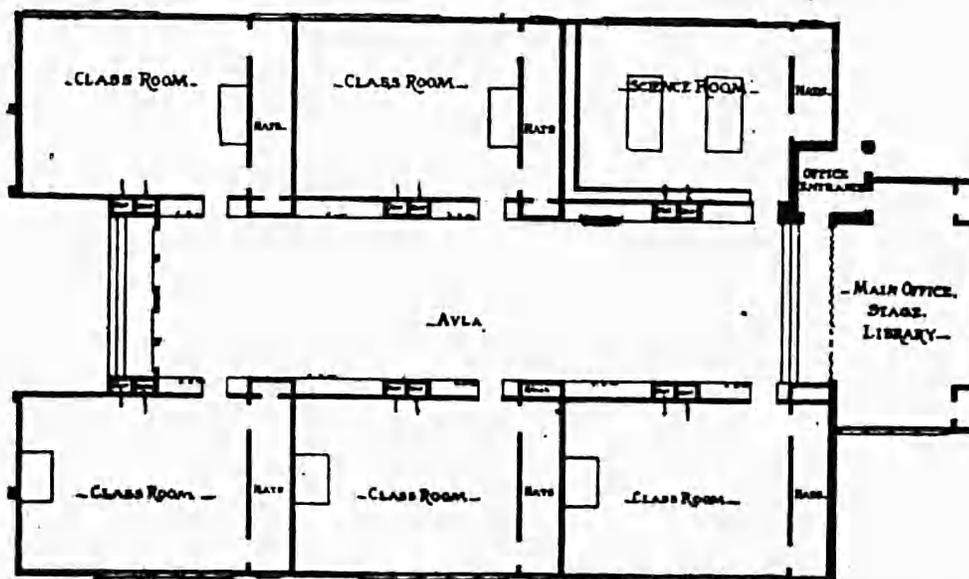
Plan for a village high school, so arranged that the hall may serve as an assembly room, with the main office as the stage.
